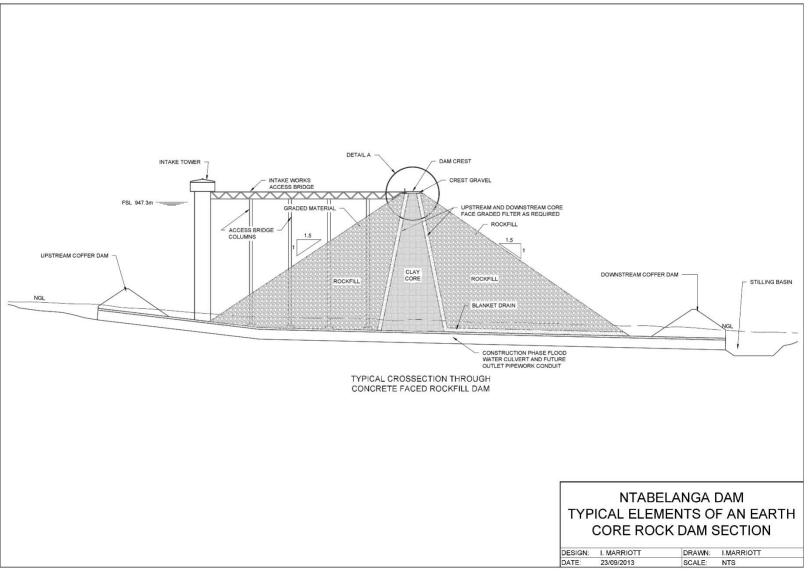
Typical Sections and Details for ECRD Type Dam
